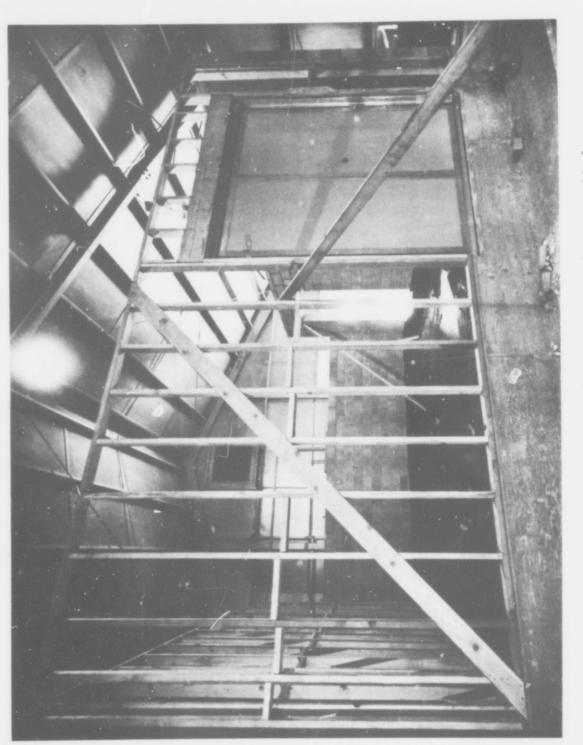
Exterior view of north wall showing equipment door mounted in frame.
